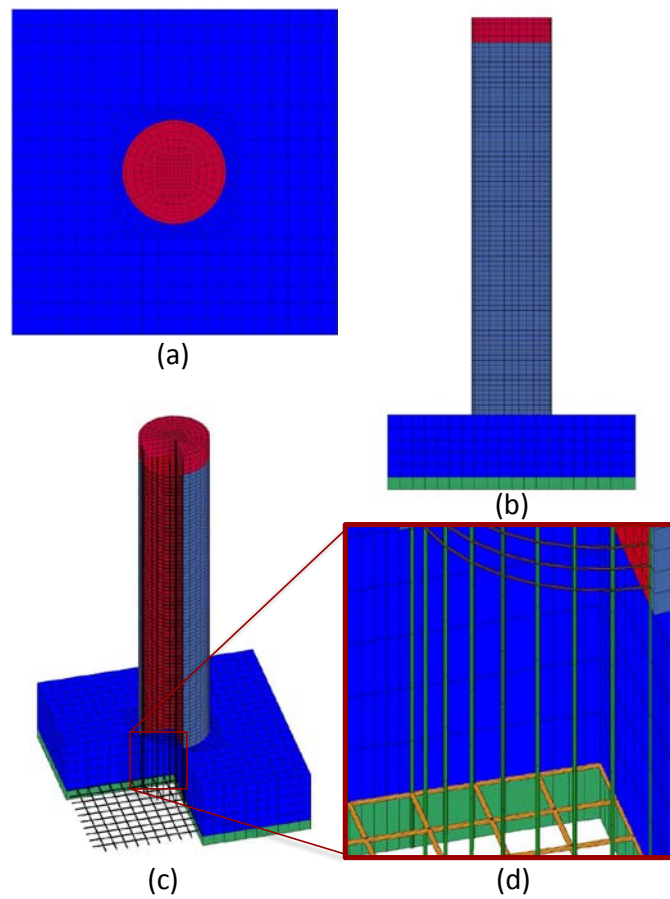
Plan (a), elevation (b), isometric cut-through (c), and reinforcement detail (d) of circular pier.
